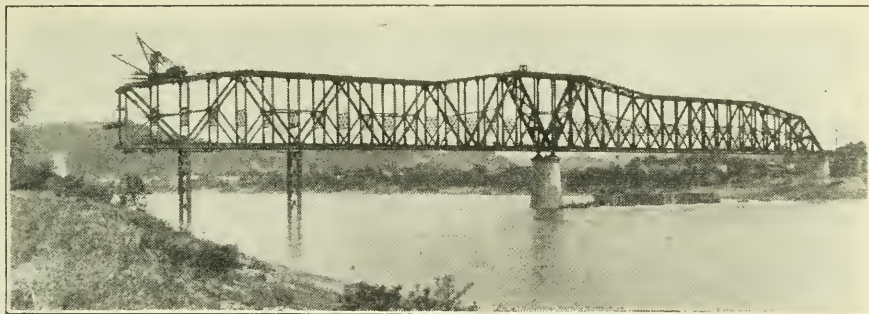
CANTILEVER SECTION, KENTUCKY SPAN, SCIOTOVILLE BRIDGE.
